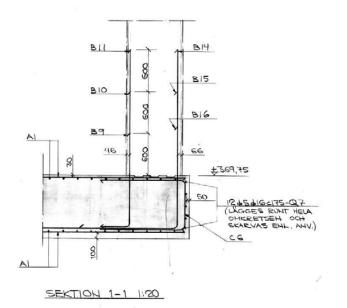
Detail for the joint between the silo outer wall and the slab.
